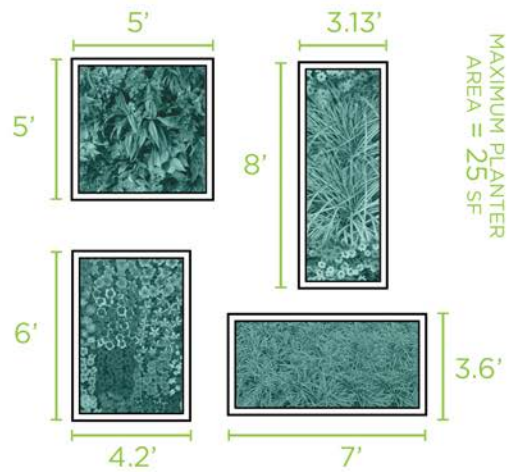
STREET PLANTER DESIGN GUIDELINES
